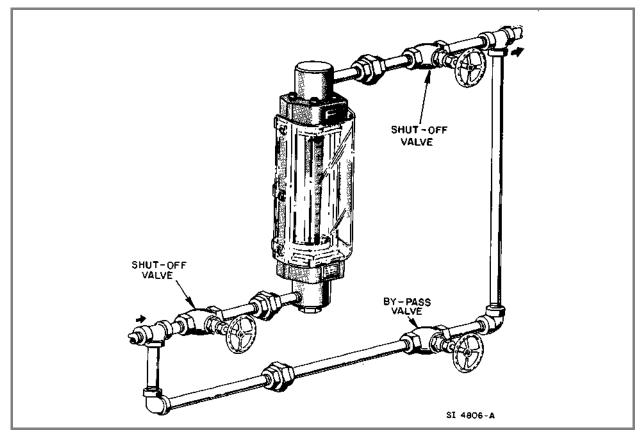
TYPICAL HORIZONTAL PIPING INSTALLATION
